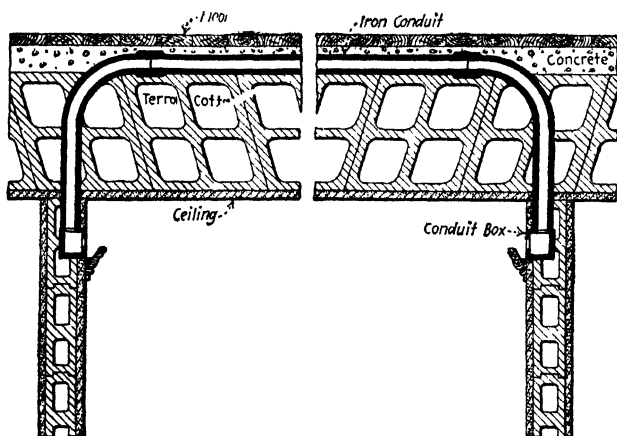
Concealed conduit connection between wooden wiring moldings on opposite sides of an office-building hall.
